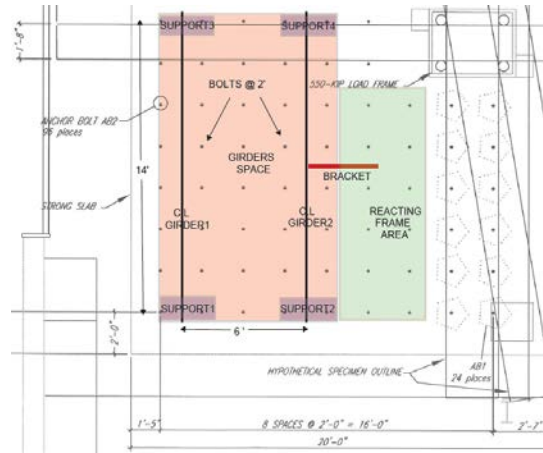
Scaled bridge model location at the SIUE Structural Engineering Laboratory.
